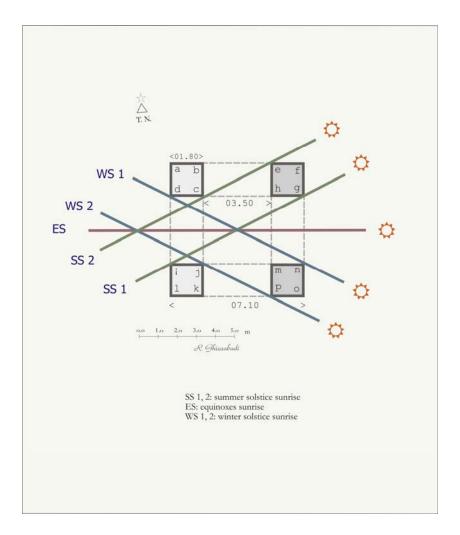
The floor plan and sightlines of Kermejegan Tetrapylon
